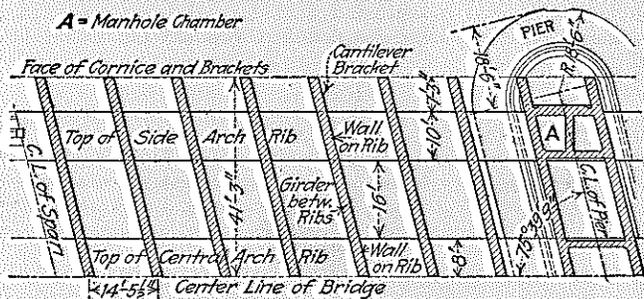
PART PLAN OF 211-FT. ARCH SPAN Showing the arch ribs and cross walls
